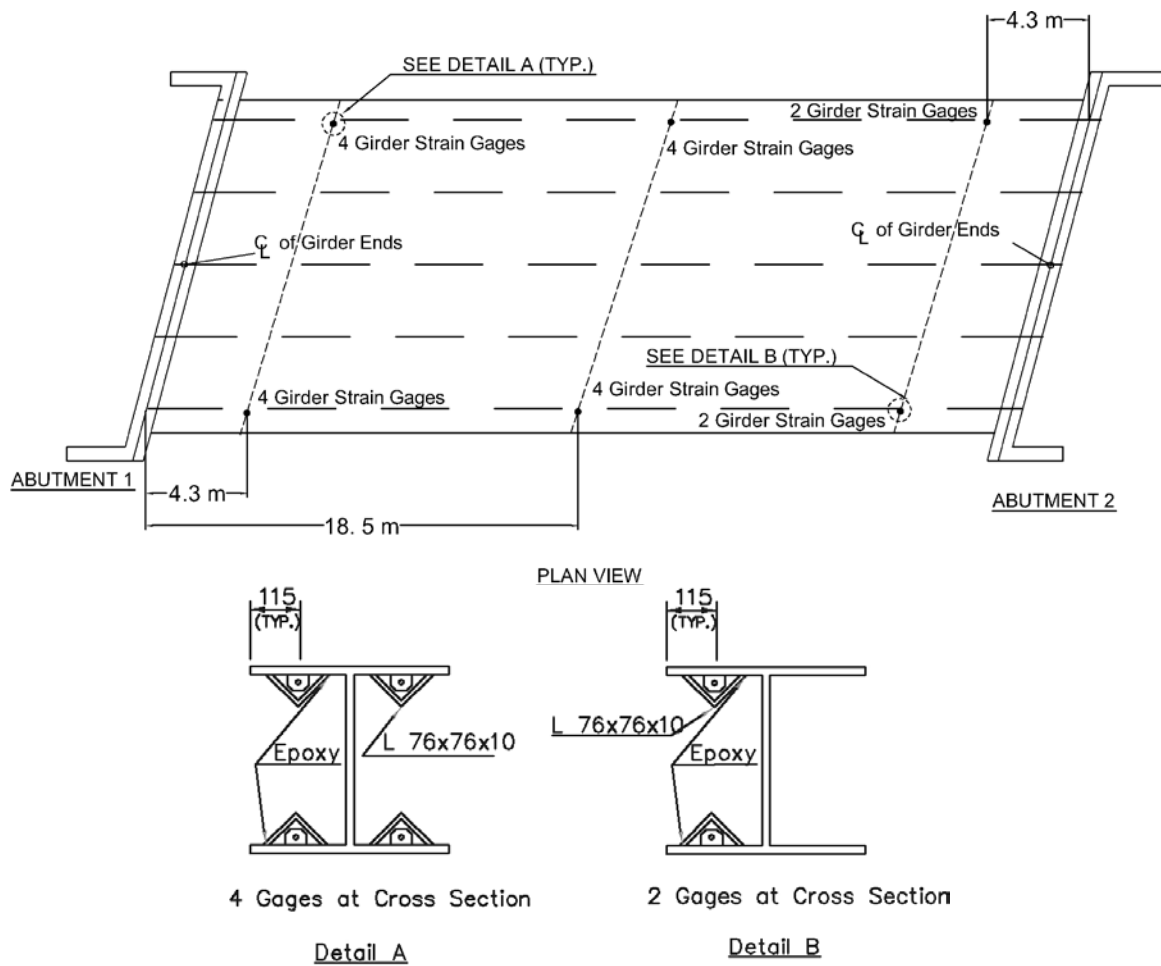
Girder Strain Gages at the East Montpelier Bridge
